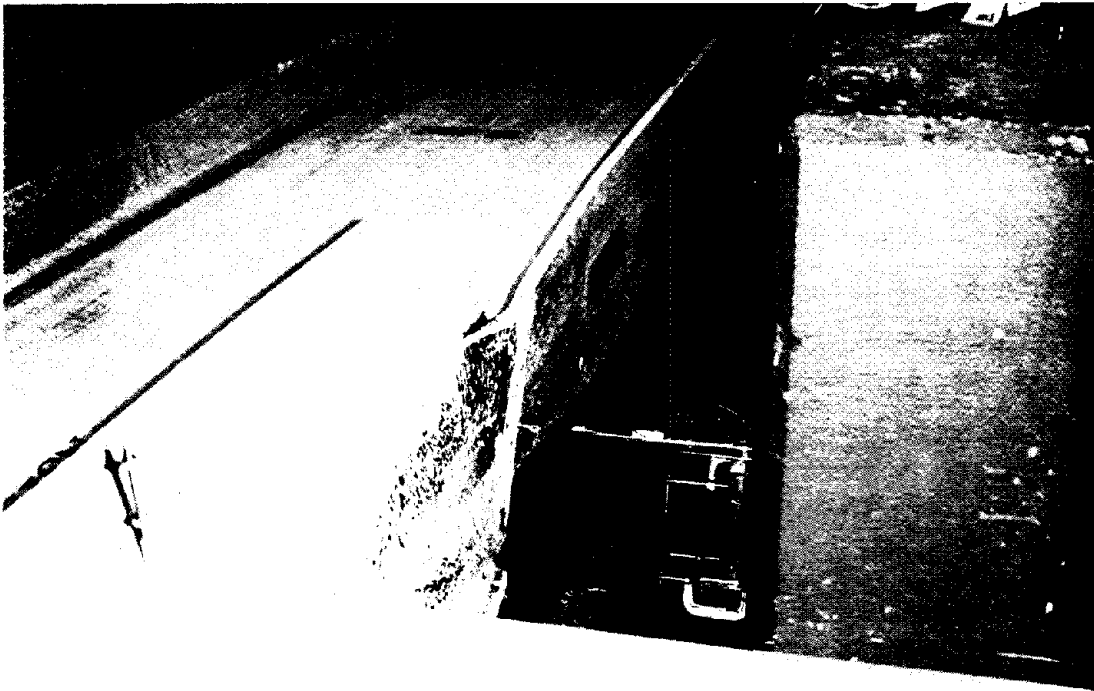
Yield Pattern and Buckling of Top Beam Flange and Subsequent Weld Tear at 4-in. Displacement, Cycle 1
